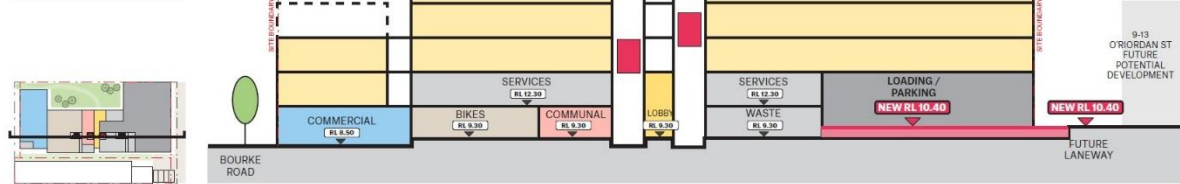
Ground floor plan - post laneway delivery and site access arrangements
